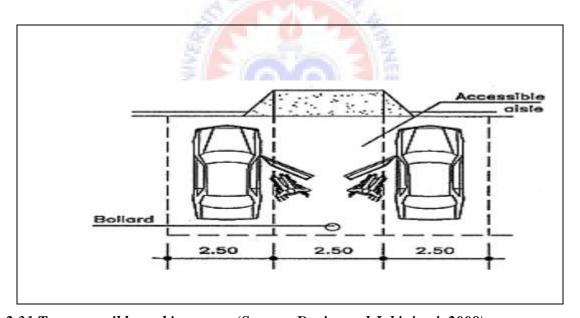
Two accessible parking space (Source: Davies and Jokiniemi, 2008)
